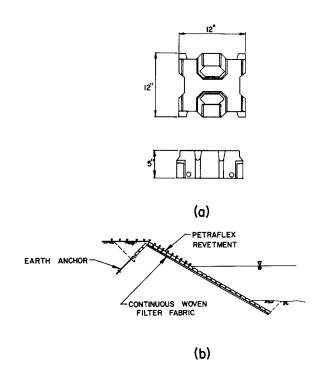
Petraflex (a) block detail and (b) revetment configuration
